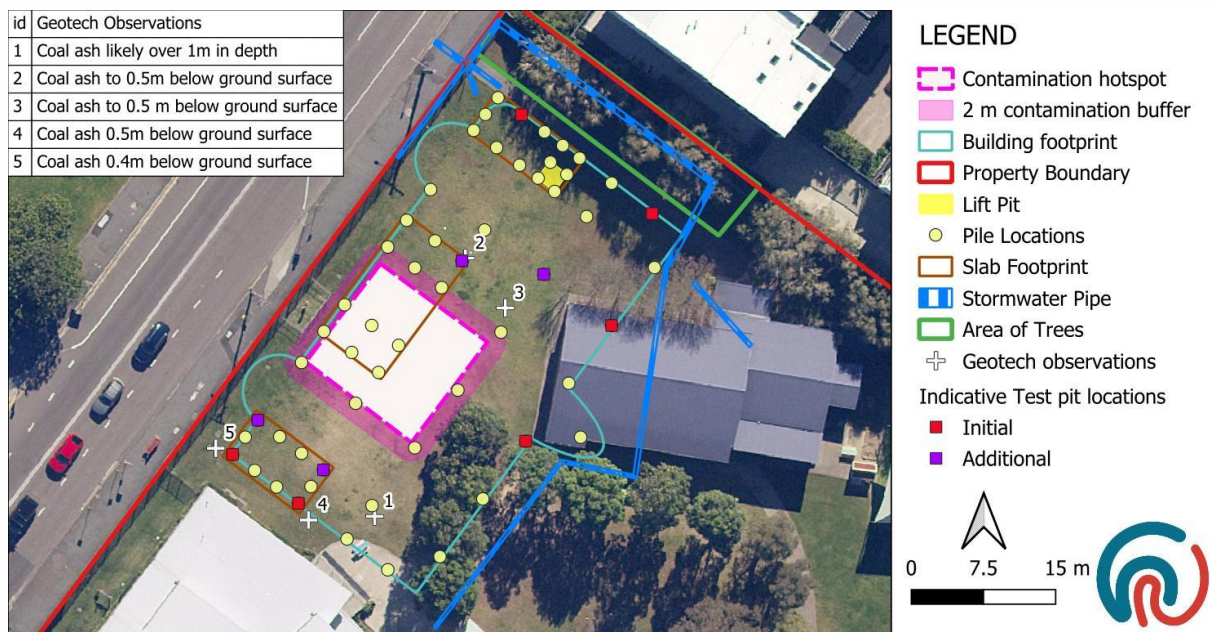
Indicative test pits for excavation (avoiding areas of contamination and trees)
